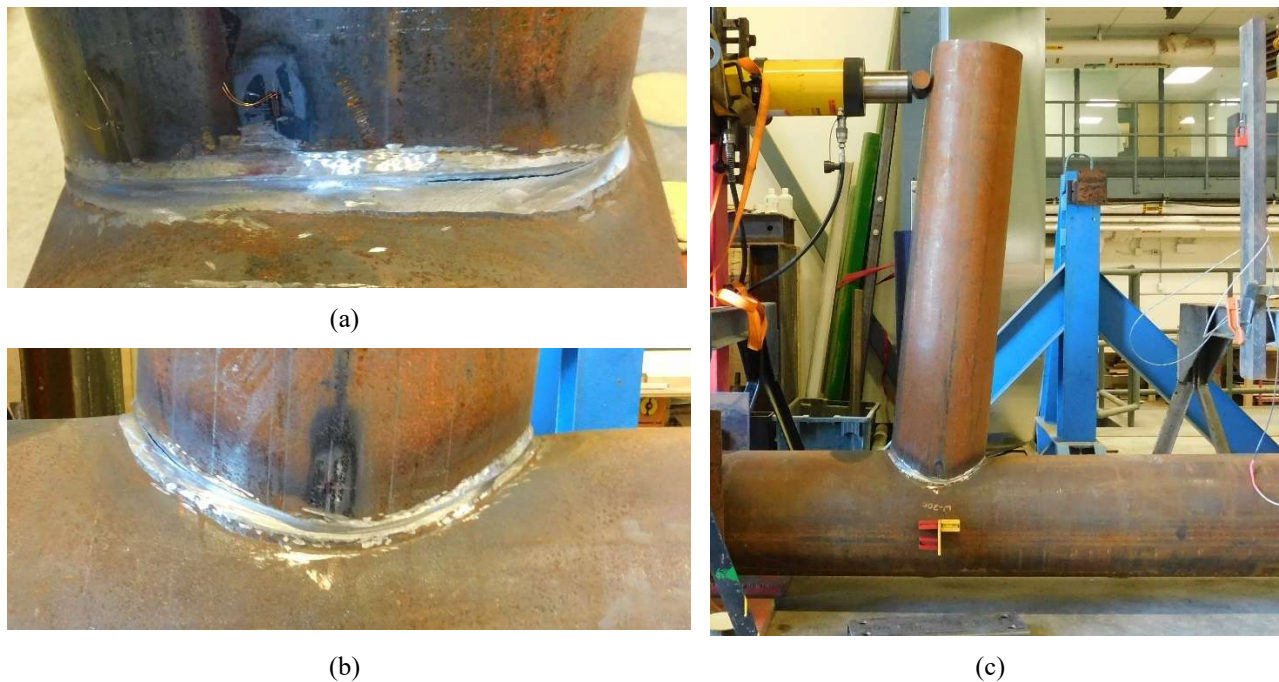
Failure of T356-273-1P (a) weld fracture, (b) chord deformation and (c) branch deformation
